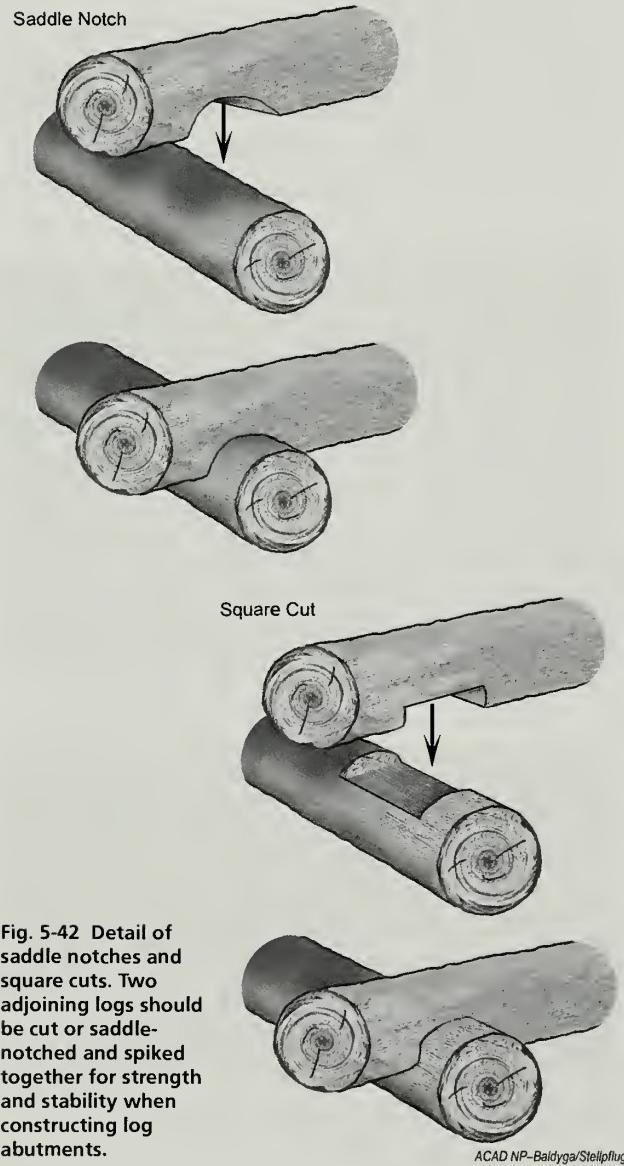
Detail of saddle notches and square cuts. Two adjoining logs should be cut or saddle-notched and spiked together for strength and stability when constructing log abutments.
